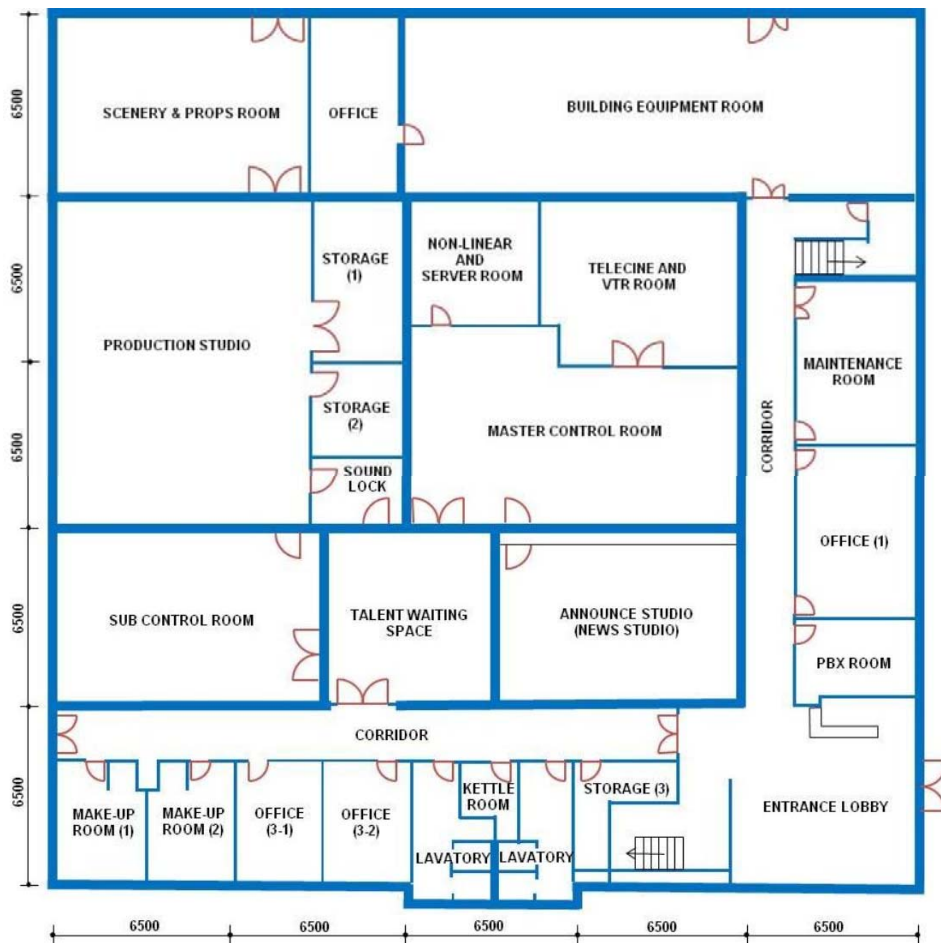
Kabul TV Station Floor Plan of First Floor
